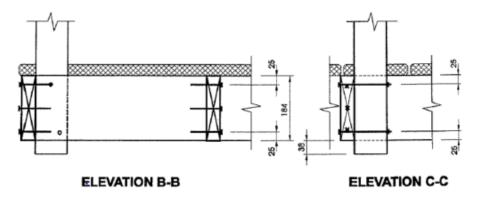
Exterior Connection: Post Bolted to 2 Floor Joist
